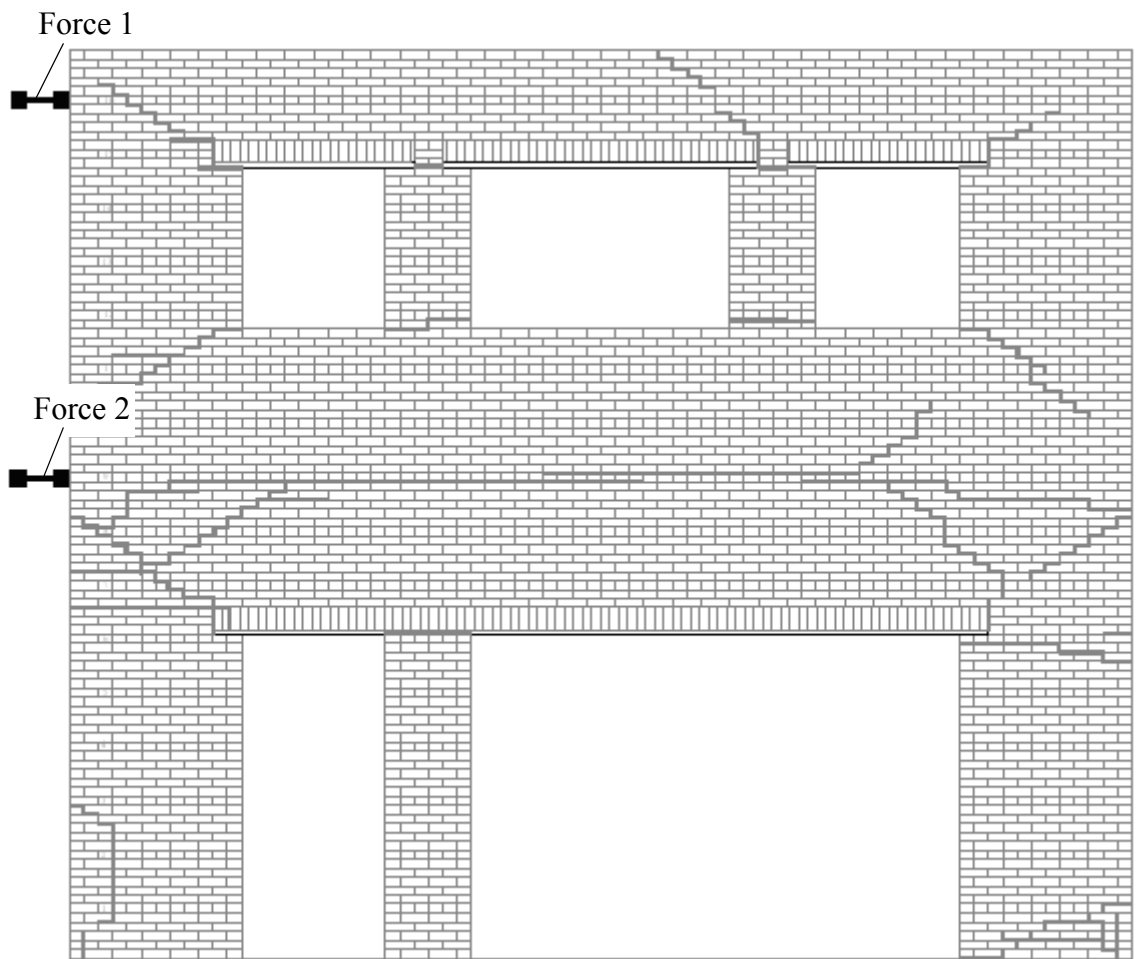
Elevation of Wall 2 illustrating the location of load cells.
